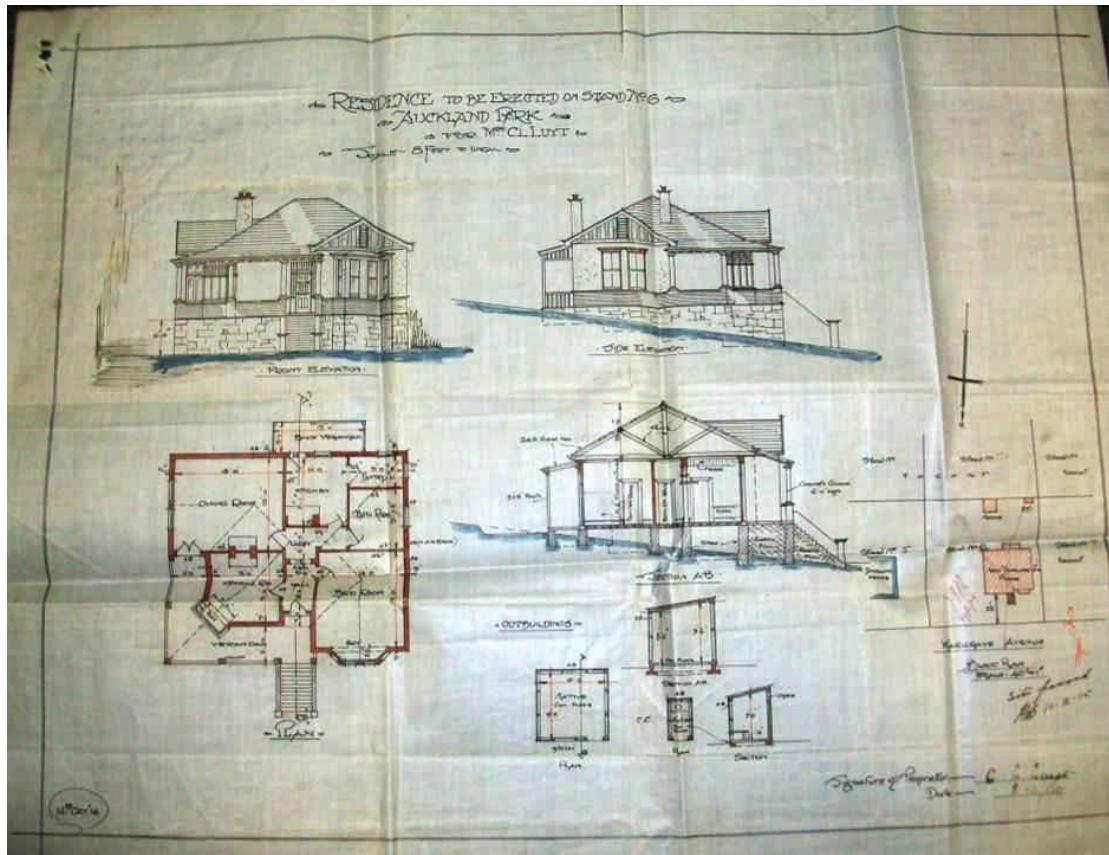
Original plan for proposed new residence on Stand 887 from 1915 (Source: City Council of Johannesburg, Plans Archive)
